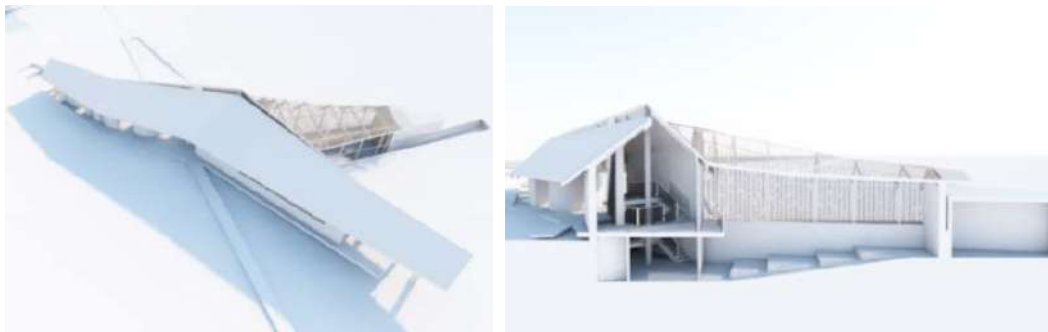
Concept for the central building of Trapisti Arboretum, Banja Luka (arch. Paper's first author, third author and second author (exact order), 2020). Section through glasshouse and entry space, showing also use of ground indentation for thermal as well as spatial reasons (lowering of building's profile, while increasing the useful height). General spatial disposition, with glasshouse being an integral part of architectural form; its presentational function is continued into the solid envelope, which it transforms through thin clearstory roof opening. Photo: paper's third author.
